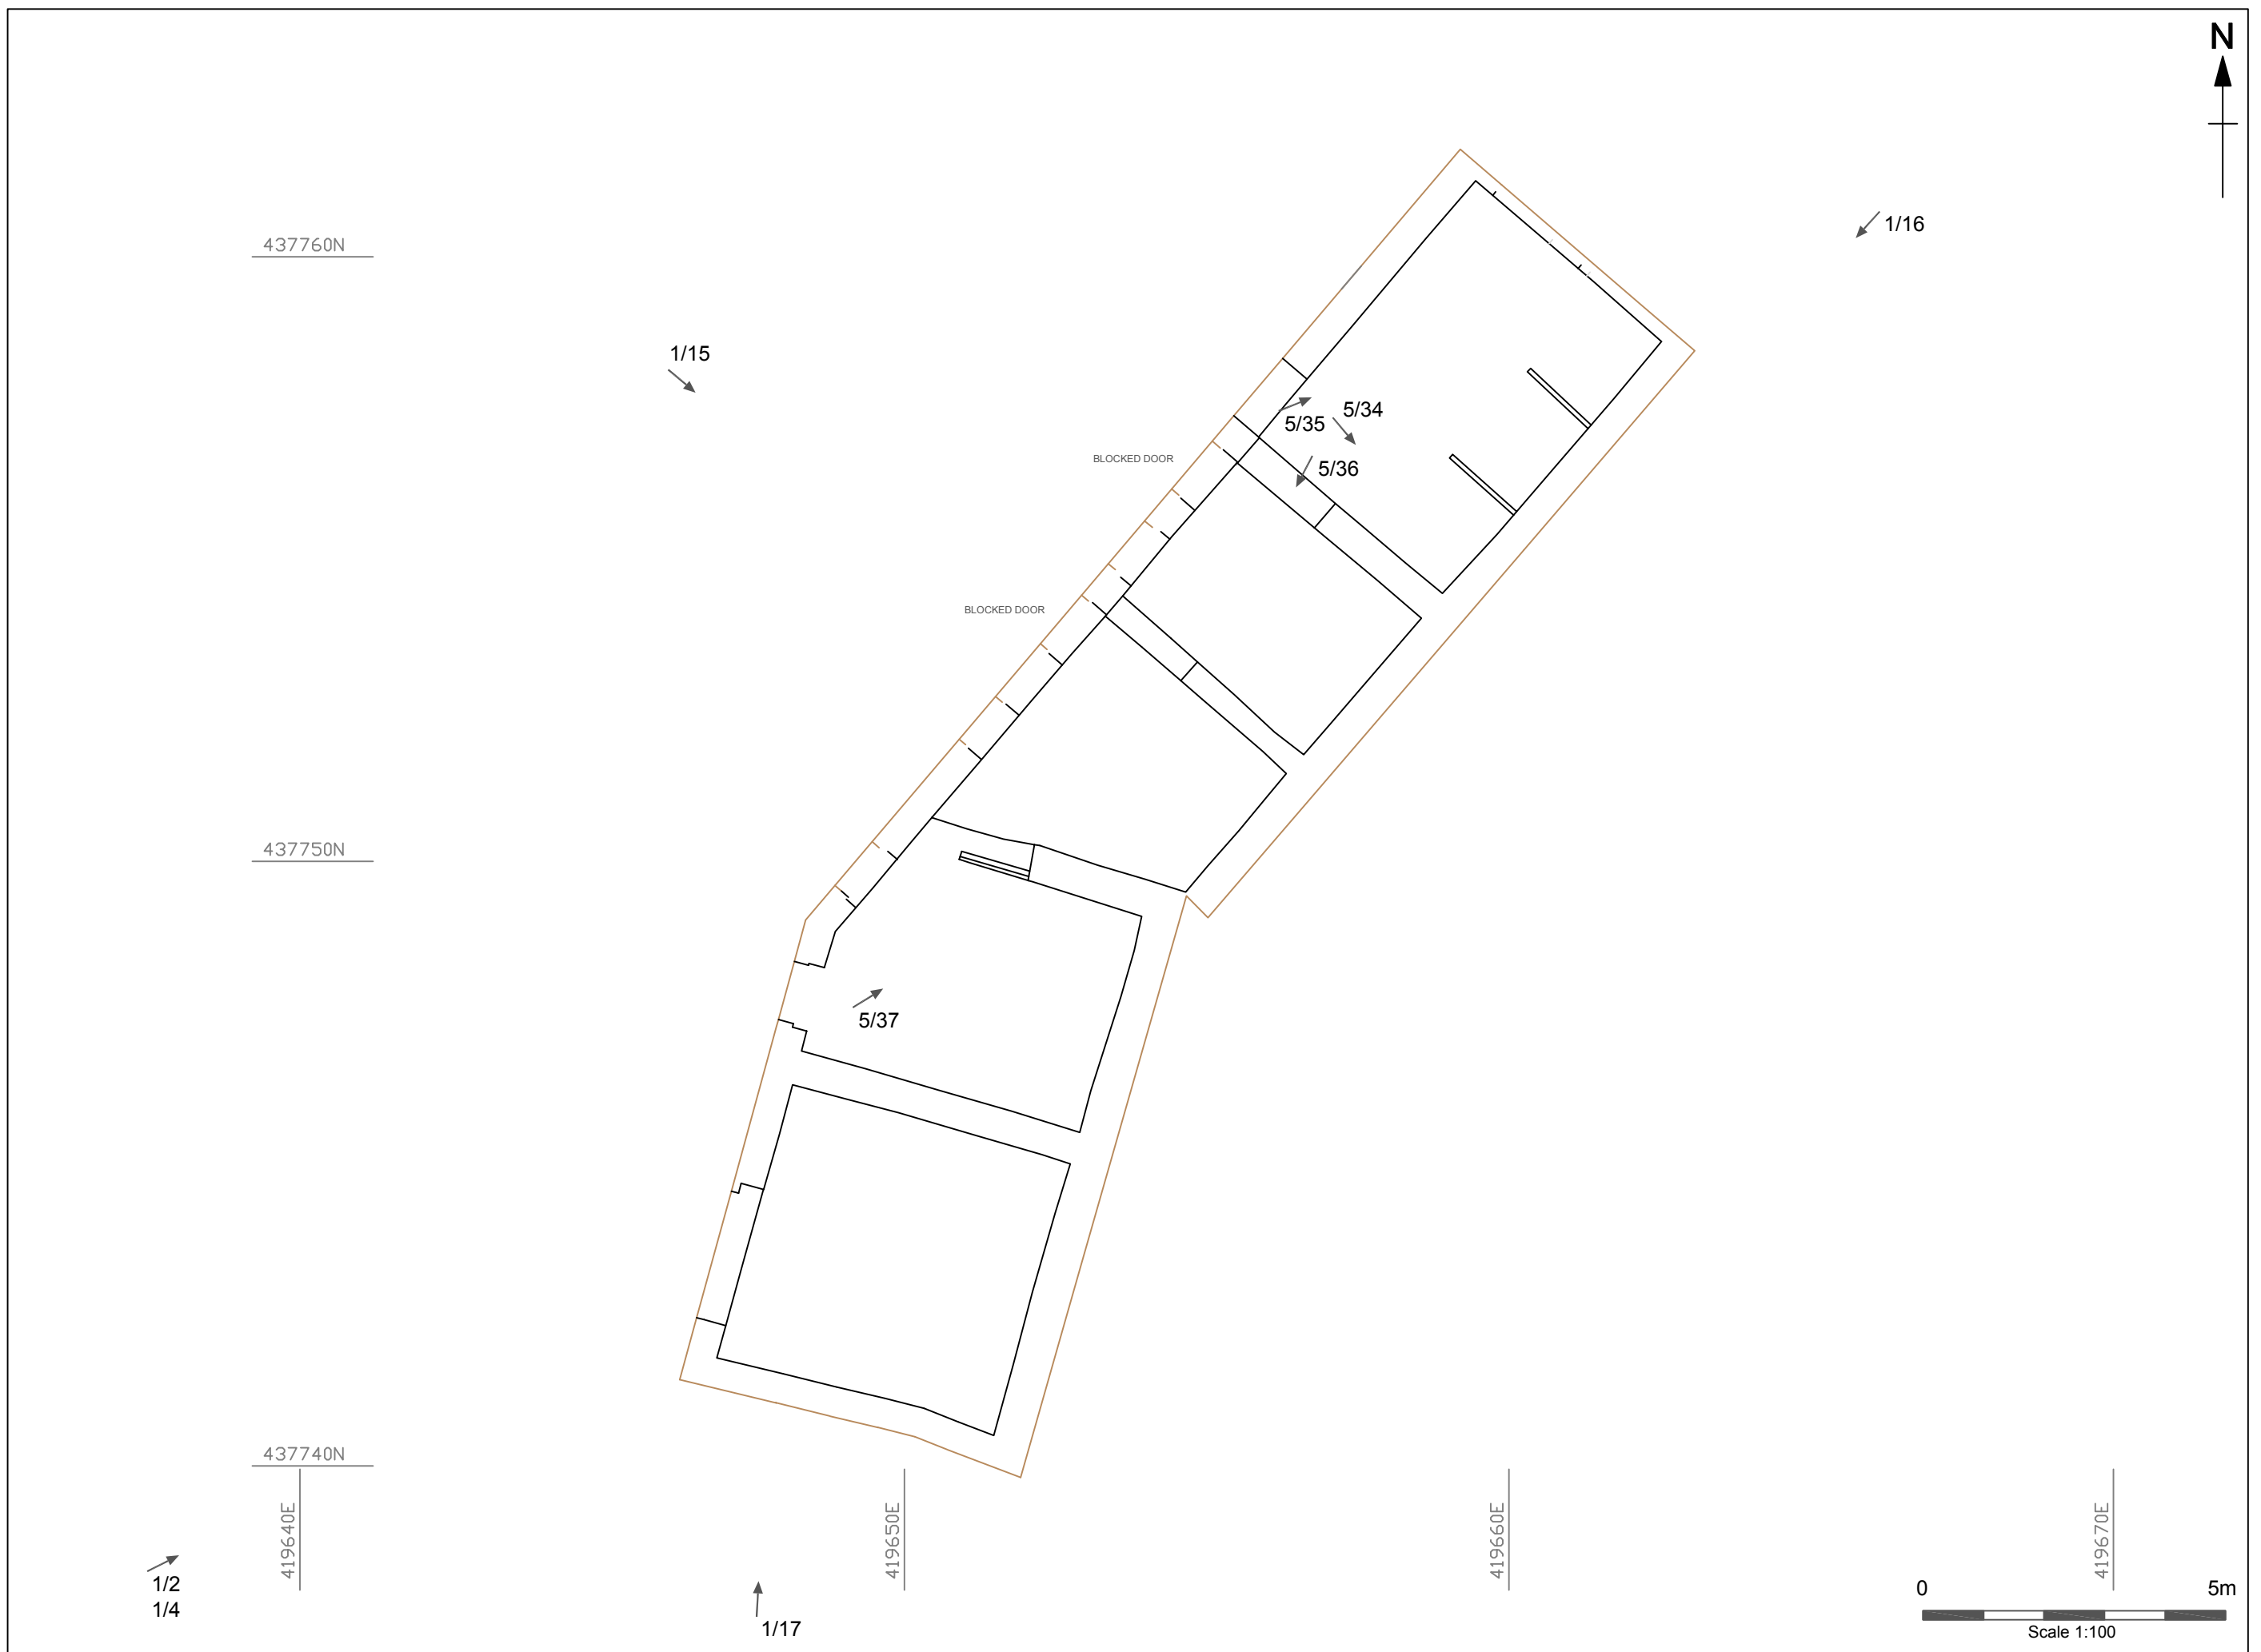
Shaw House Farm: Stable Ground Floor Plan.
